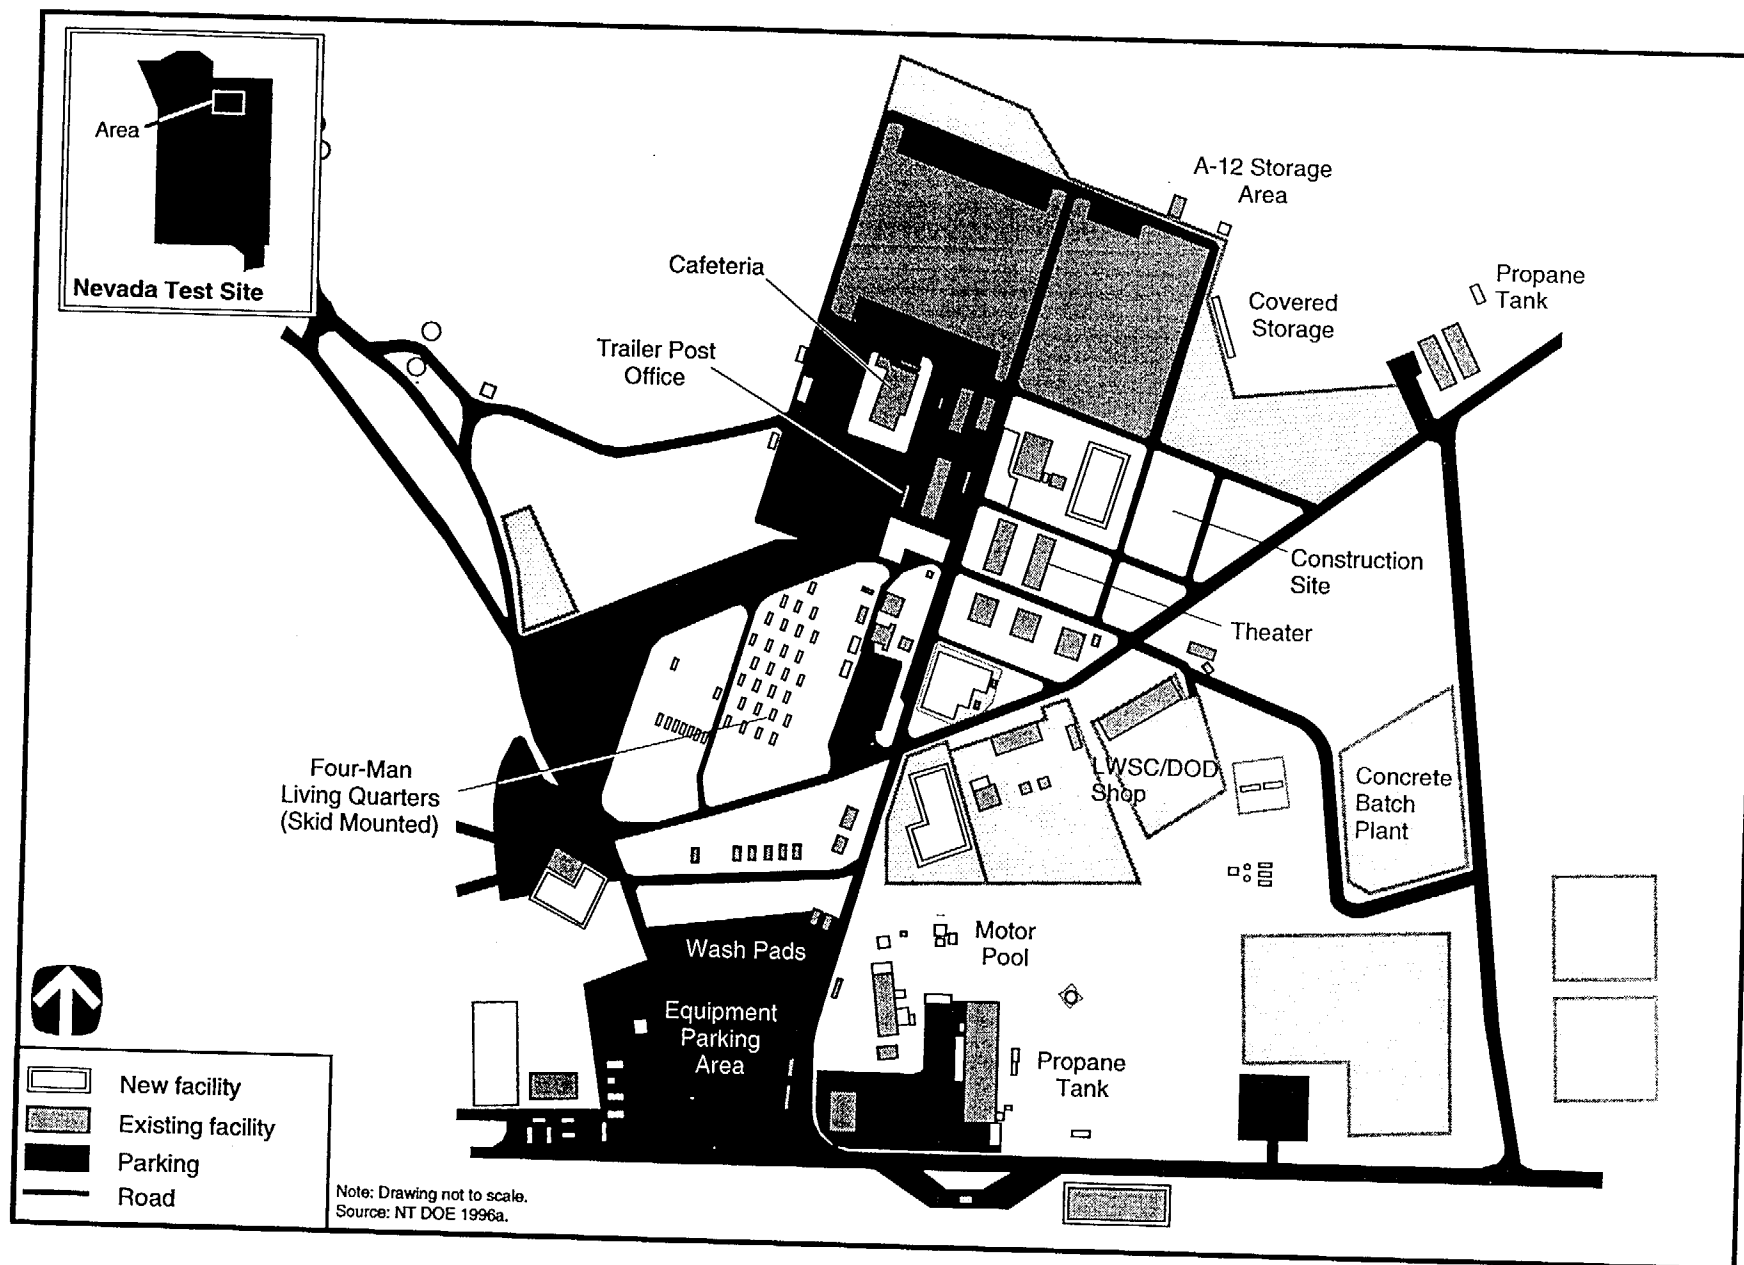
Proposed Area 12 Modifications for the Collocated Plutonium and Highly Enriched Uranium Storage Facility at Nevada Test Site (Plan View).
